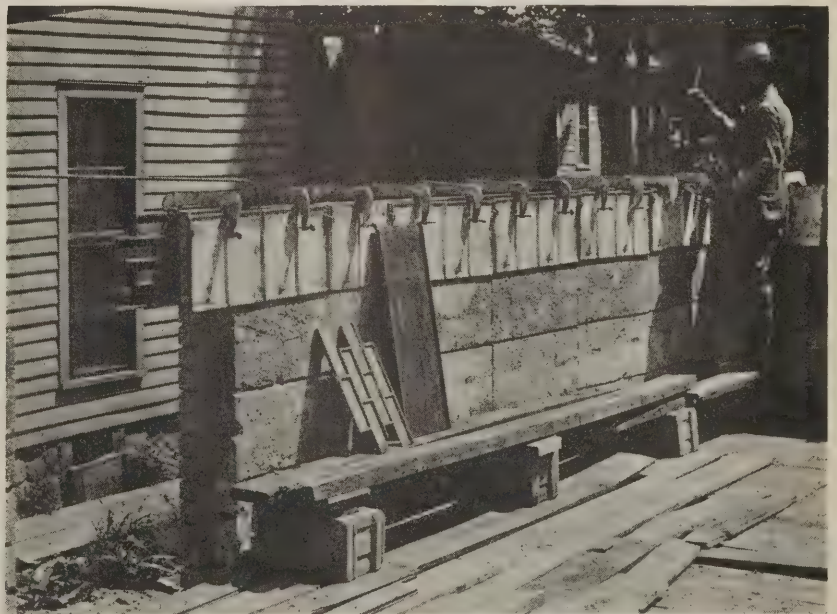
Showing forms as placed. Note the ribbed form plate propped against the wall. These plates are used on the exterior walls
